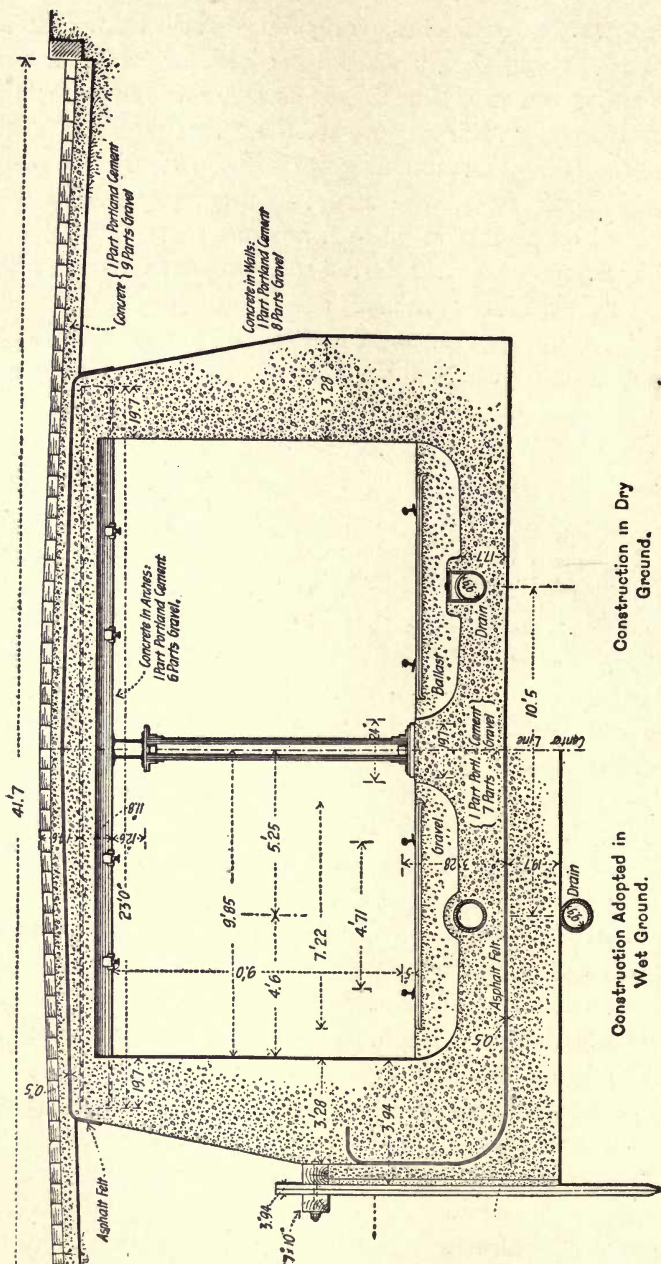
Buda-Pest Subway: Typical Cross-section.
